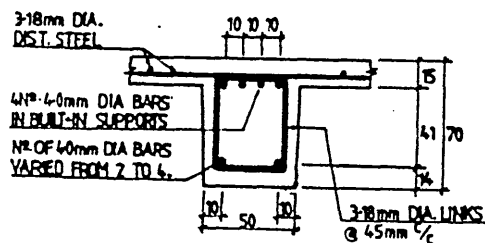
Typical Cross-Section of a Portion of Long Spanning Rib
